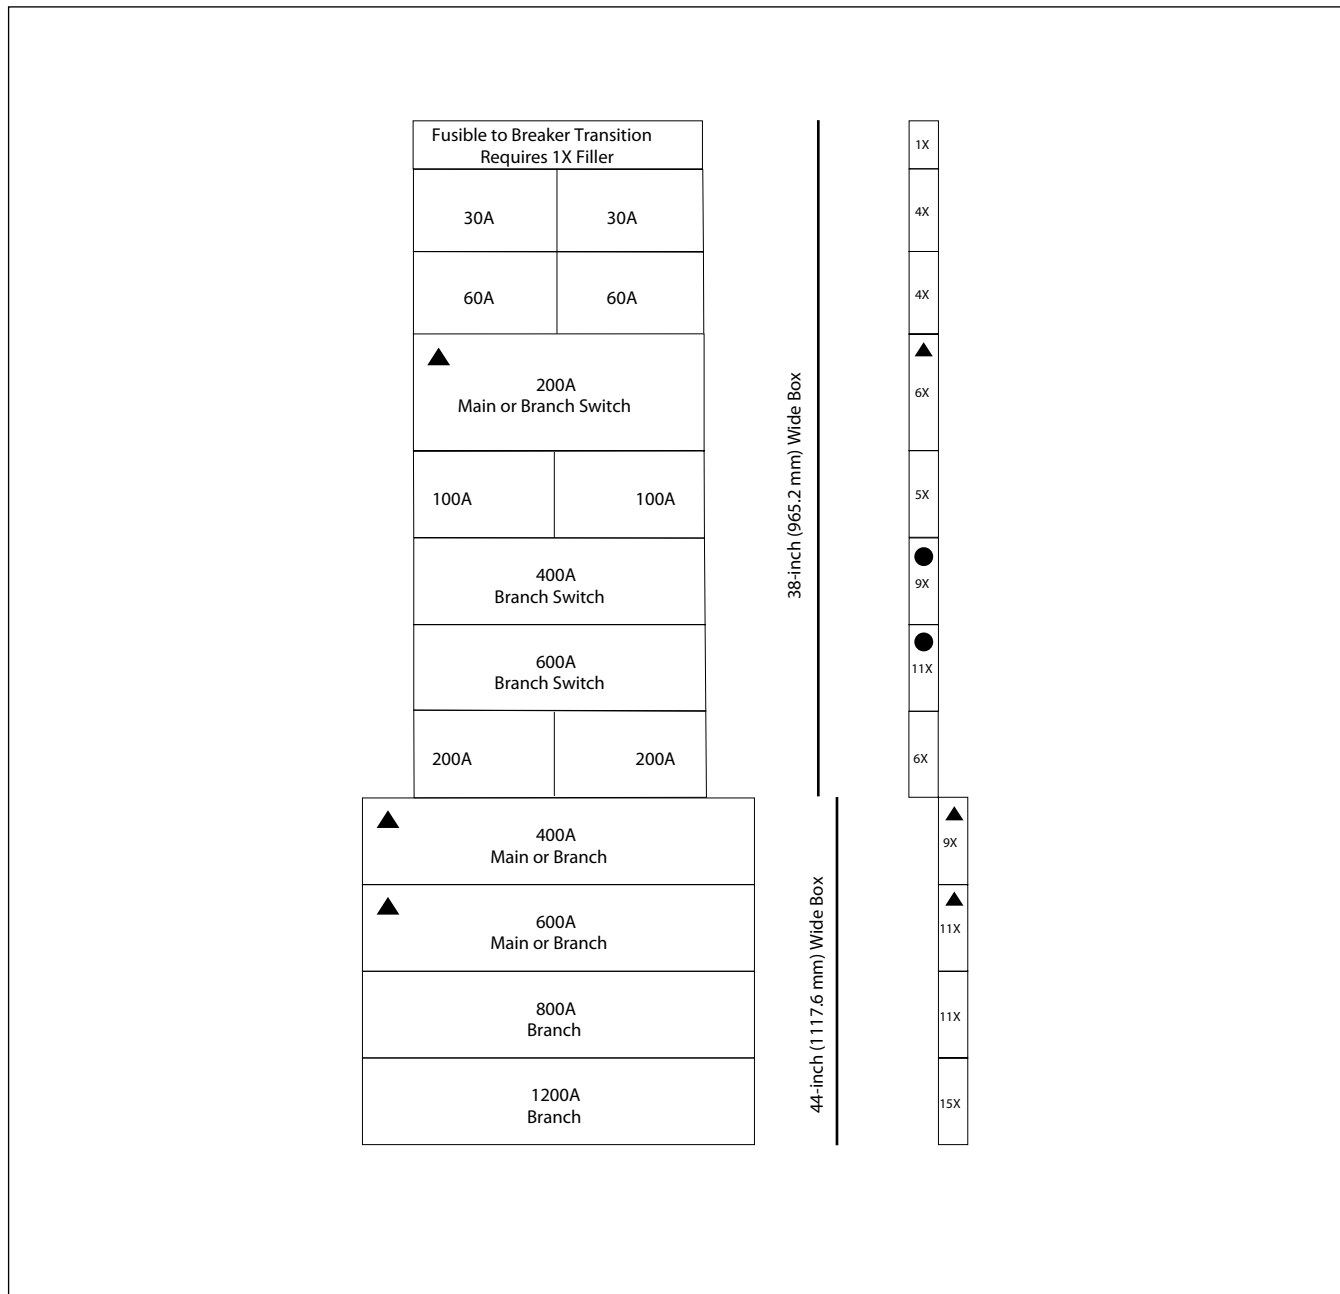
Branch and Horizontally Mounted Main Device Layout — PRL4F
